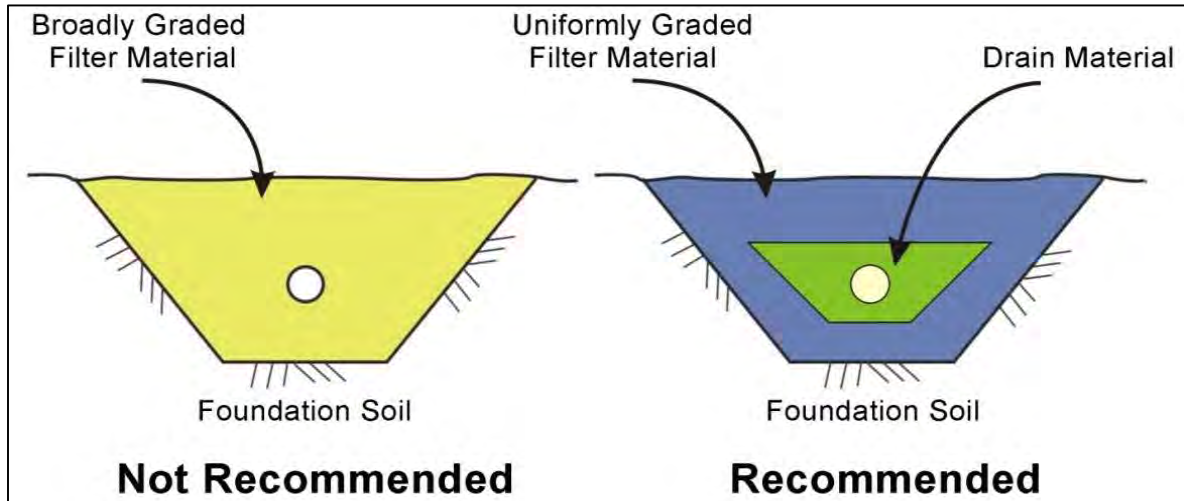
Typical one-stage (left) and two-stage (right) toe drains in a trapezoidal trench.
